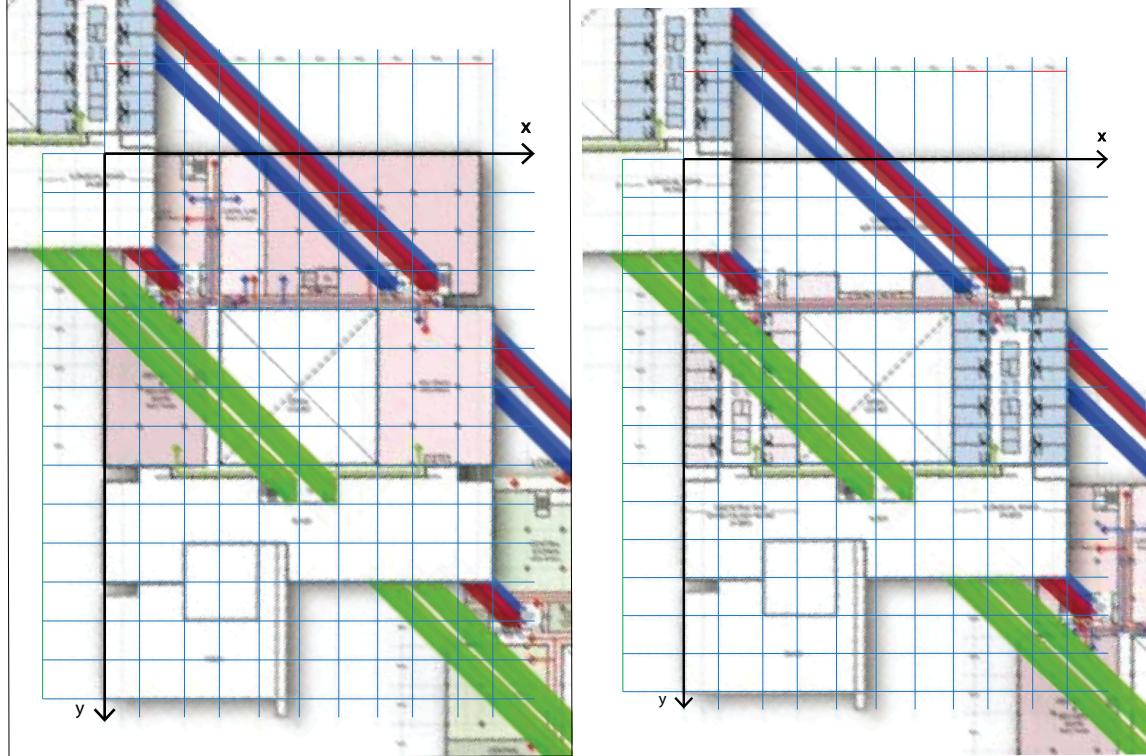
The zooming of two floor plans, with evidenced the structural grid (in blue): (a) first floor; (b) second floor.
